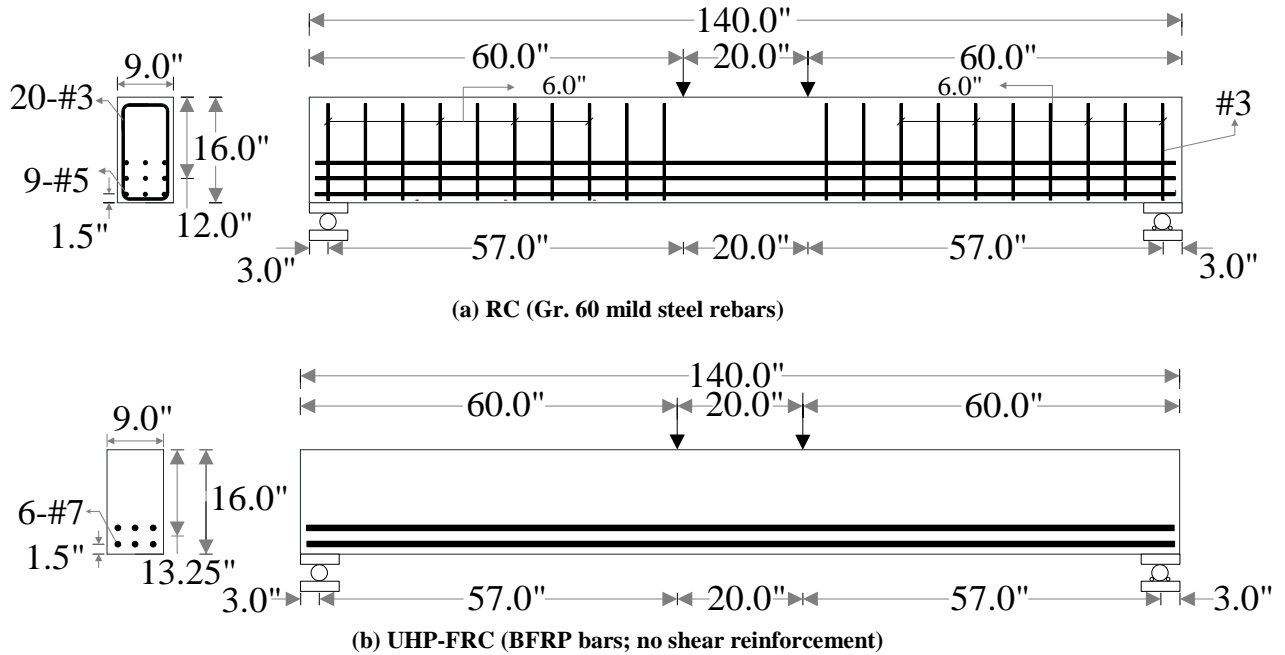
Reinforcement details: (a) conventional RC beam; (b) UHP-FRC beam with BFRP bars (no shear reinforcement).
